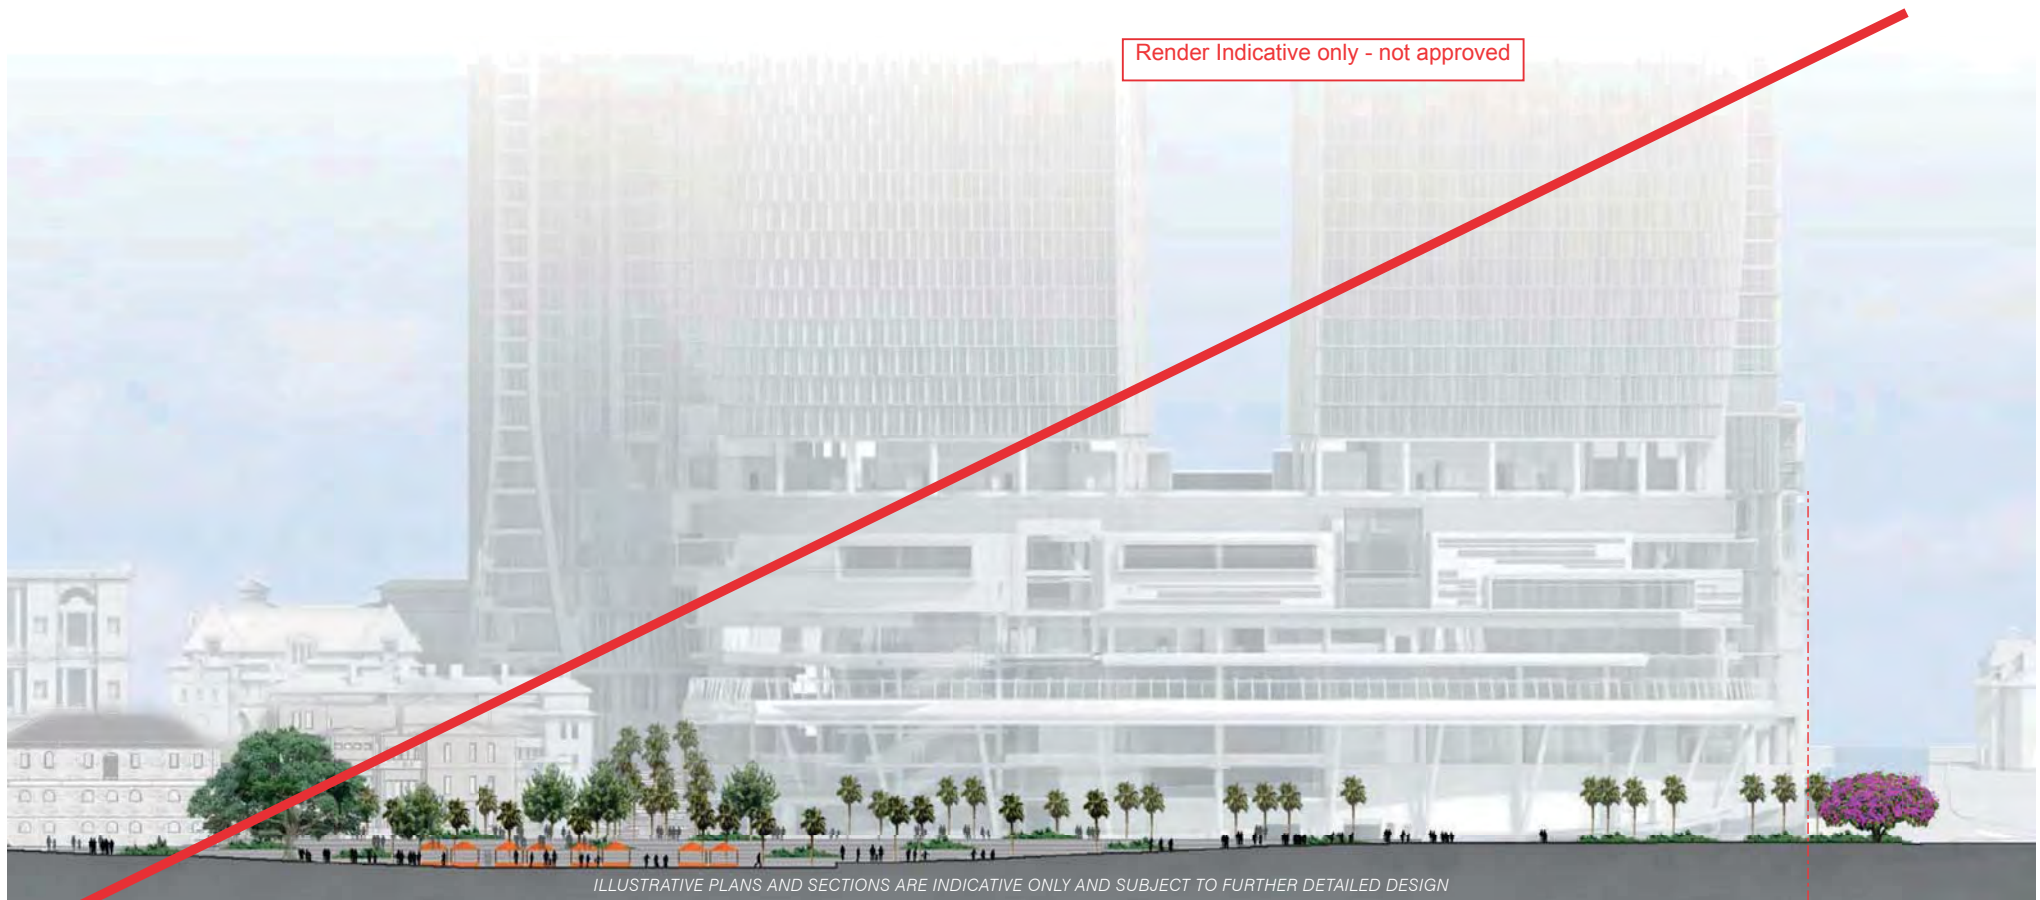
William Street South Sectional Elevation (Not to scale)
